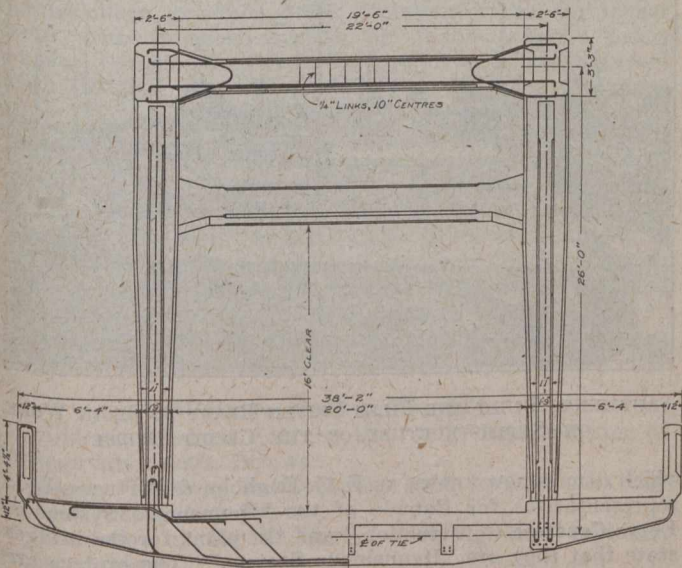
CROSS-SECTION AT CENTRE OF BRONTE BRIDGE
